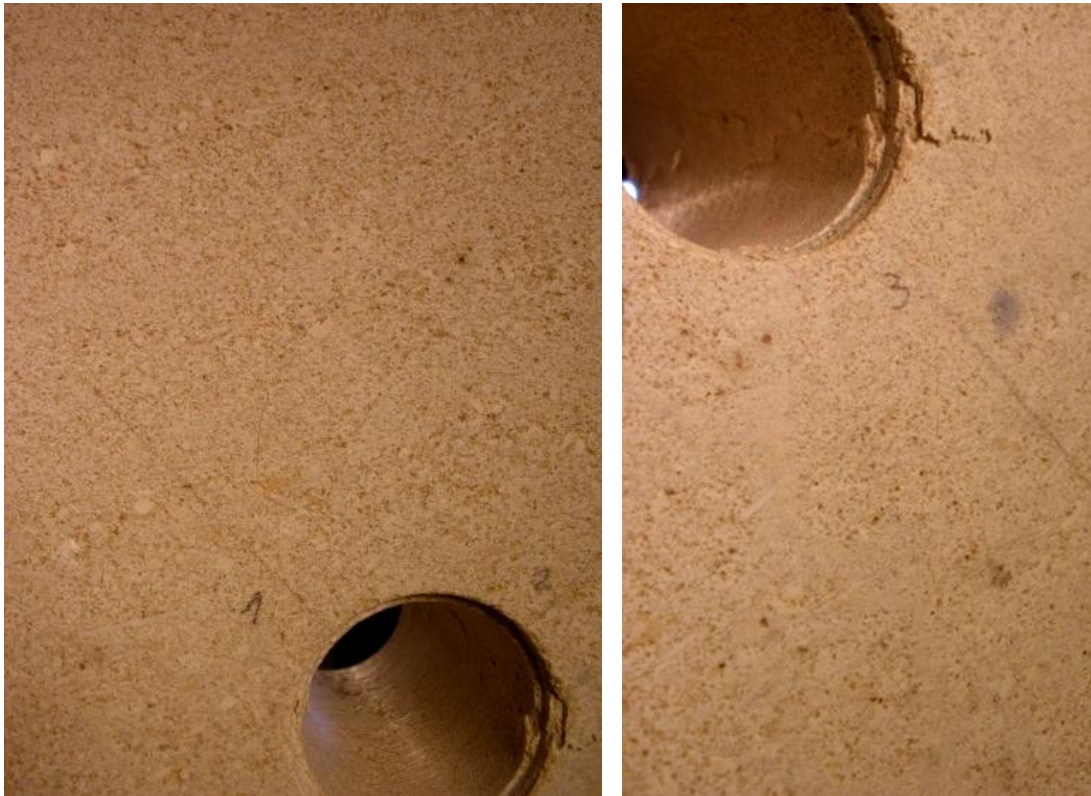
Cracks in specimen 22 for point 2 of the figure 5.38. Cracks on the side A of the specimen.
